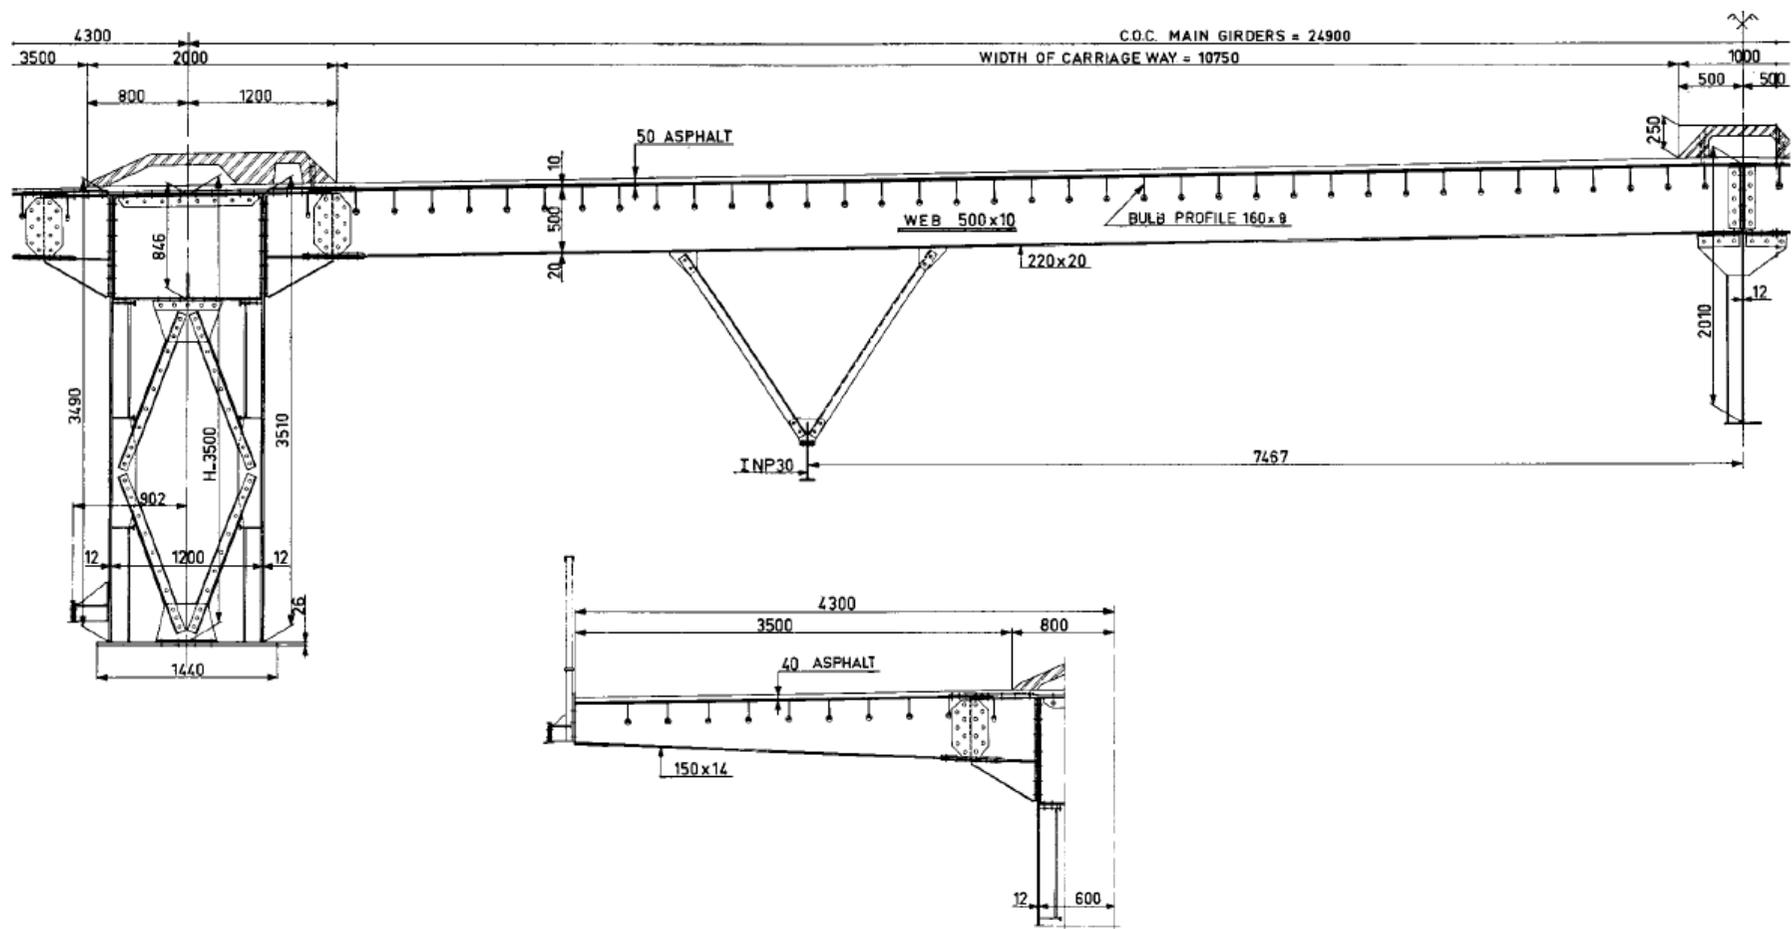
Secondary cross girder with suspension construction for track of inspection car.
